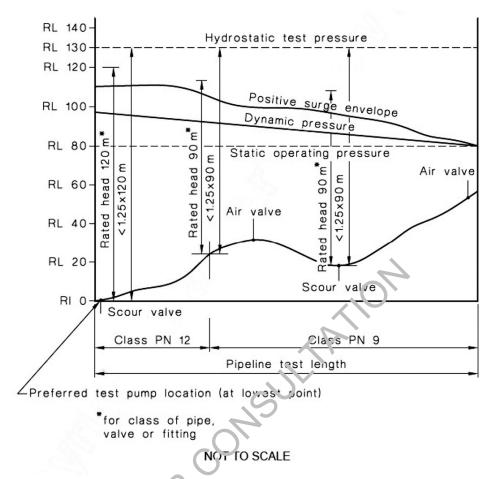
Typical pressure p'oe ine under field hydrostatic test
